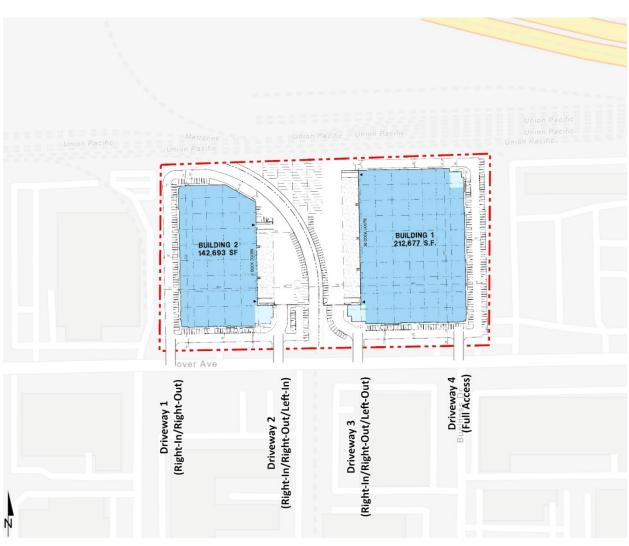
PRELIMINARY SITE PLAN
